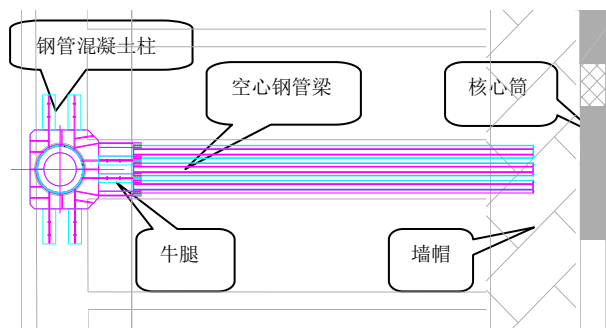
The connection diagram of hollow steel beam and steel tube column and core barrel wall cap
